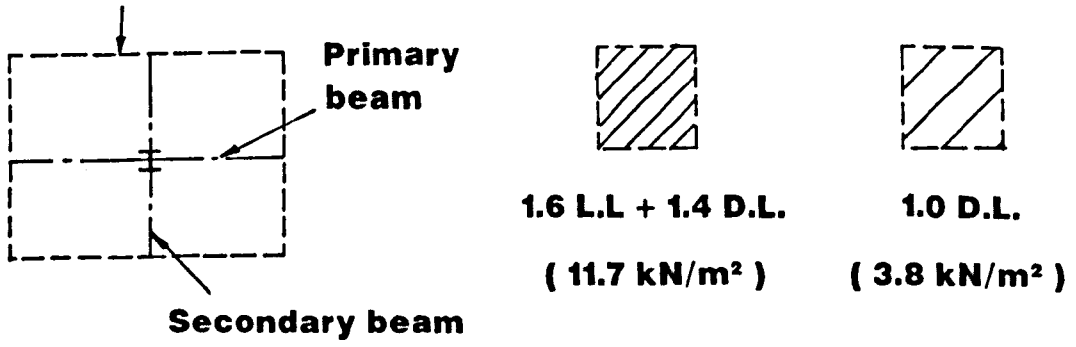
Arrangement of floor loading for load cases 1 to 9.
